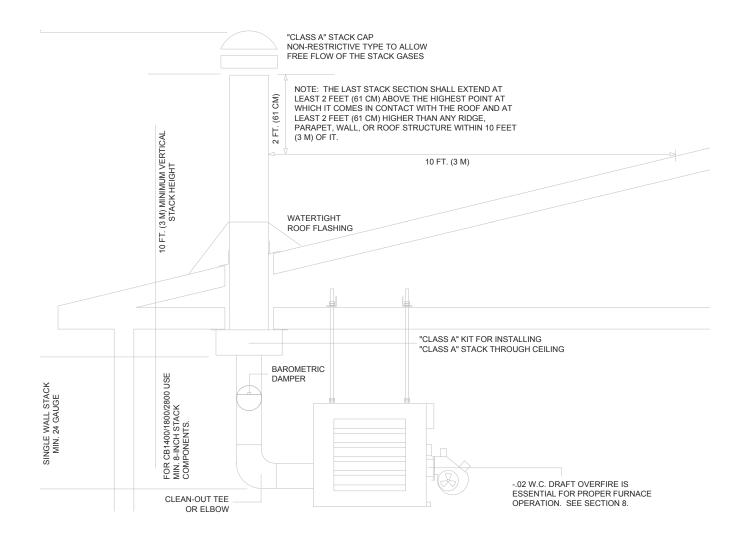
I - Installation of "Class A" Stack Through Roof/Ceiling
